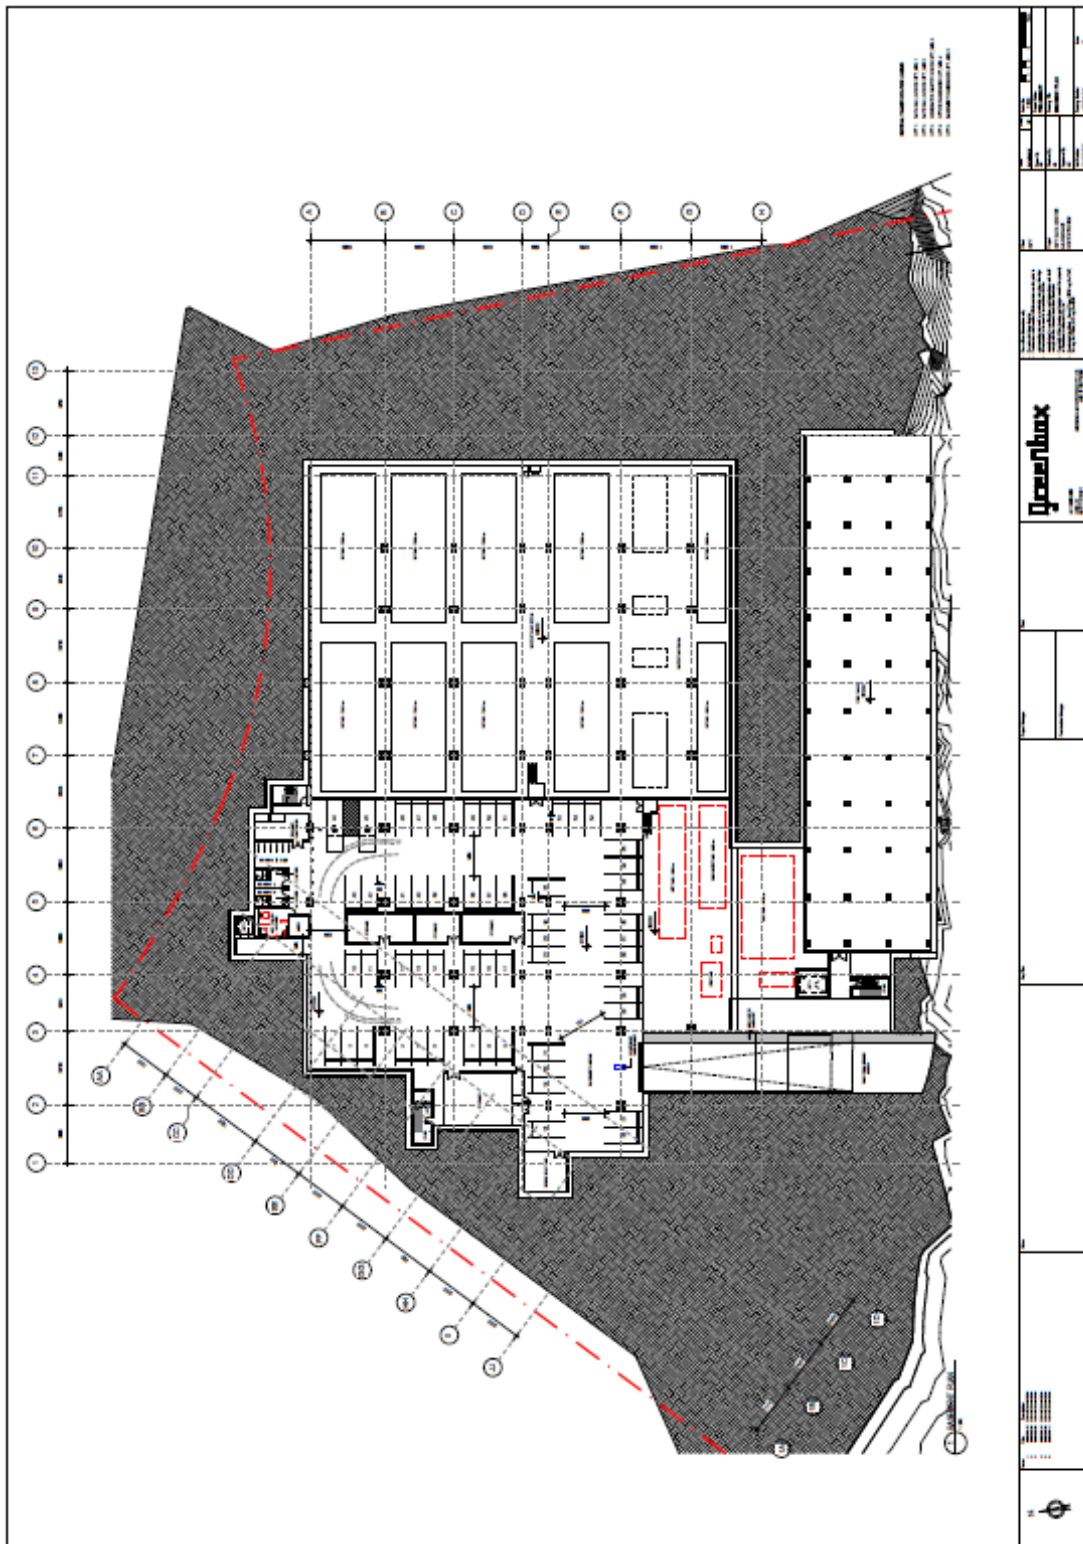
Basement level plan, showing areas of deep excavation into bedrock. (Source: Greenbox Architecture, 2025)
